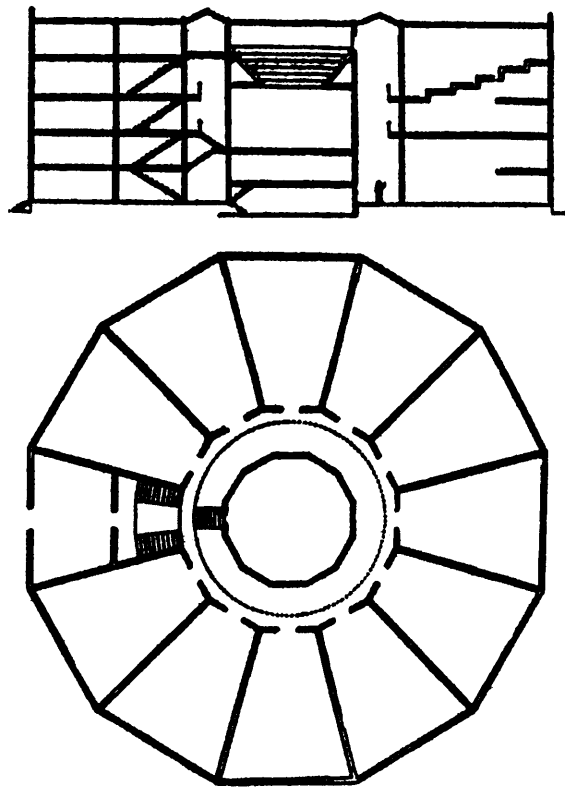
Jeremy Bentham's section and plan of a Panopticon building (Friedberg 1998, 255).
